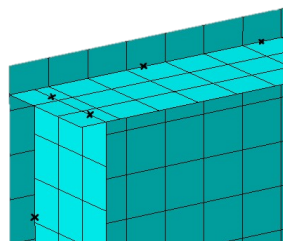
Illustration of the fasteners connecting the boards and the timber frame.
